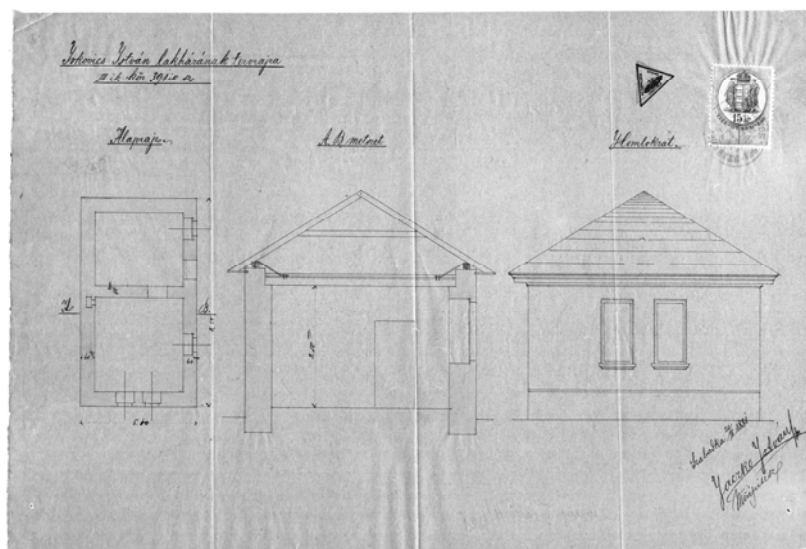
Plan of Stipan Ivković's two room house built in 1881 (HAS, F:2, ép. eng. III kör 4/1881.)
